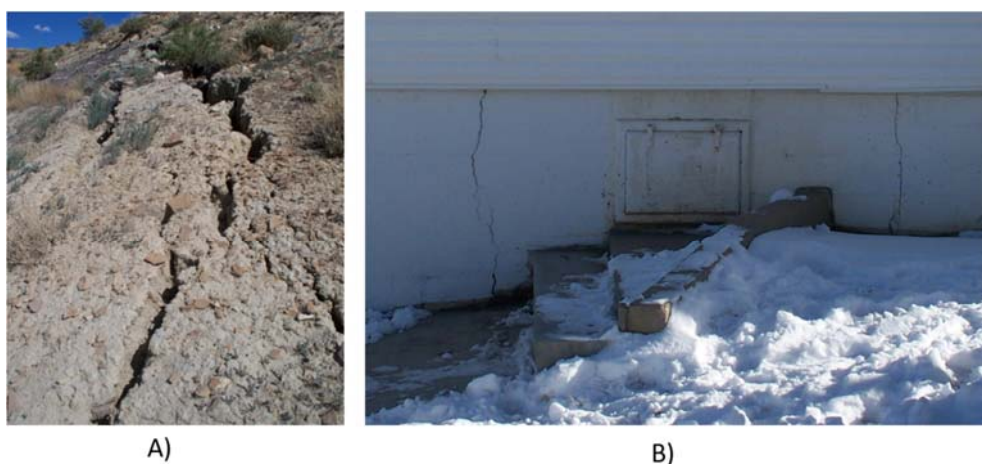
Evidences of surface displacement A) Surface cracks. B) Cracks in a building at Wyoming street
